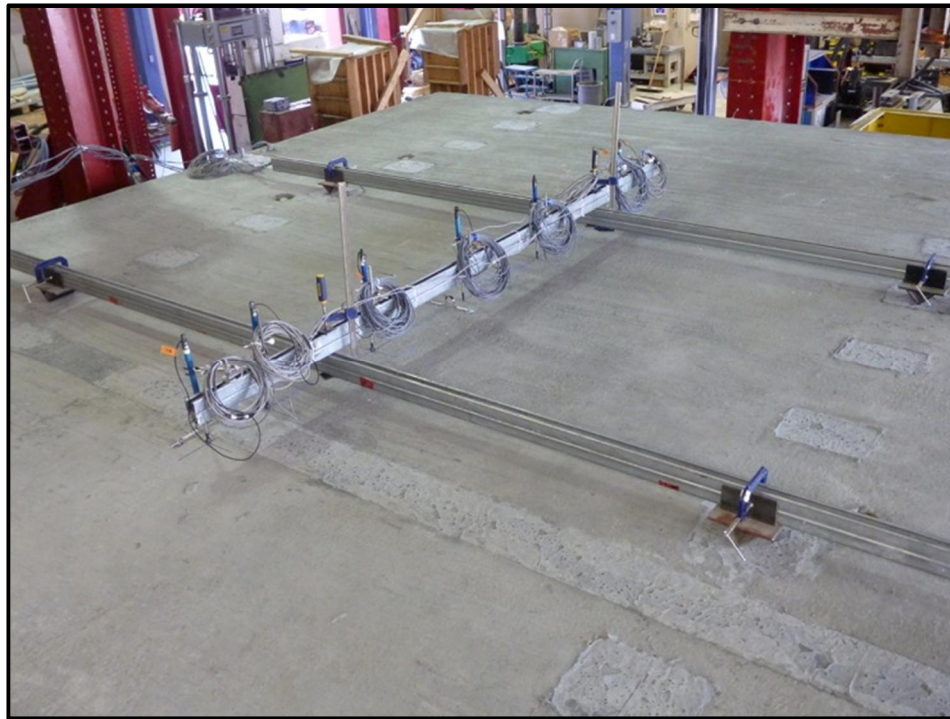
Typical Uni-strut LVDT Rack with LVDTs (Test #1 Setup Shown)
